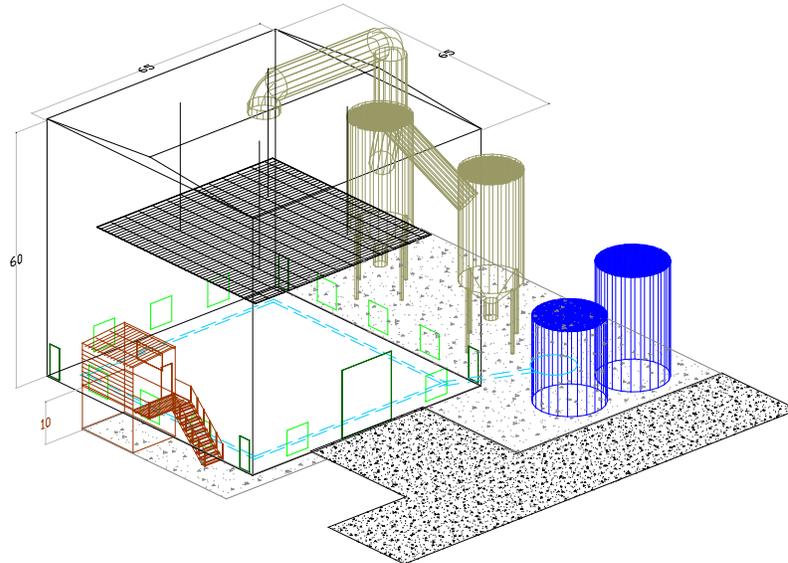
Large-Scale Fire Engineering and Research Facility Layout.
